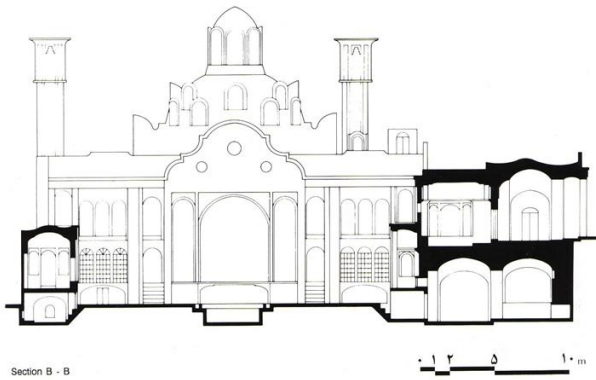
Broujerdi House (Section B_B) Kashan (URL 18)
